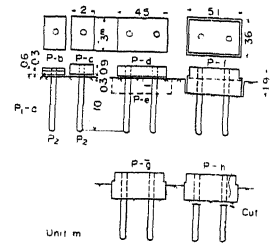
Pile head Condition used to observation of the Earthquake and vibration test (Exp No III)
